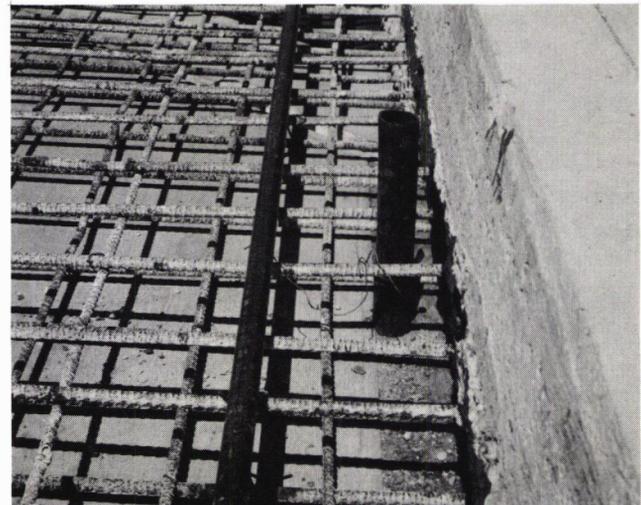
Forming and reinforcing steel in place on structure; vertical pipe provides weep hole in new deck slab, New York Thruway.
